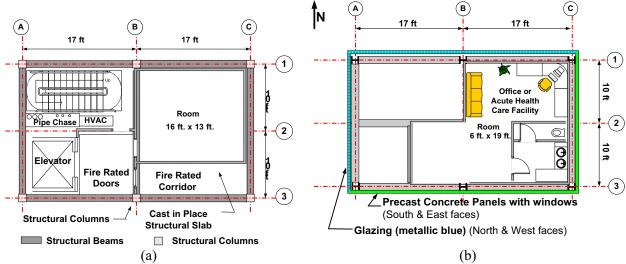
Schematic plans of floor layouts at (a) lower floors (1 and 2) and (b) upper floors (3-5).
